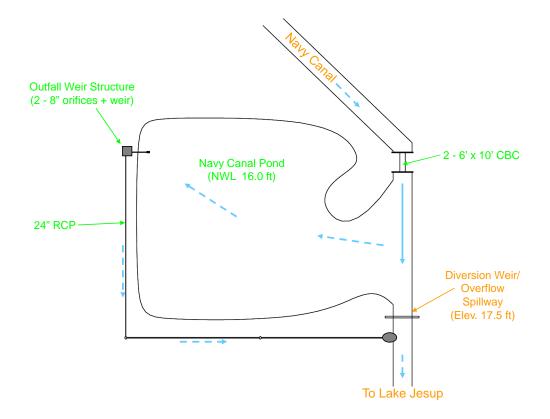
Schematic of System Components of the Navy Canal Stormwater Facility.
